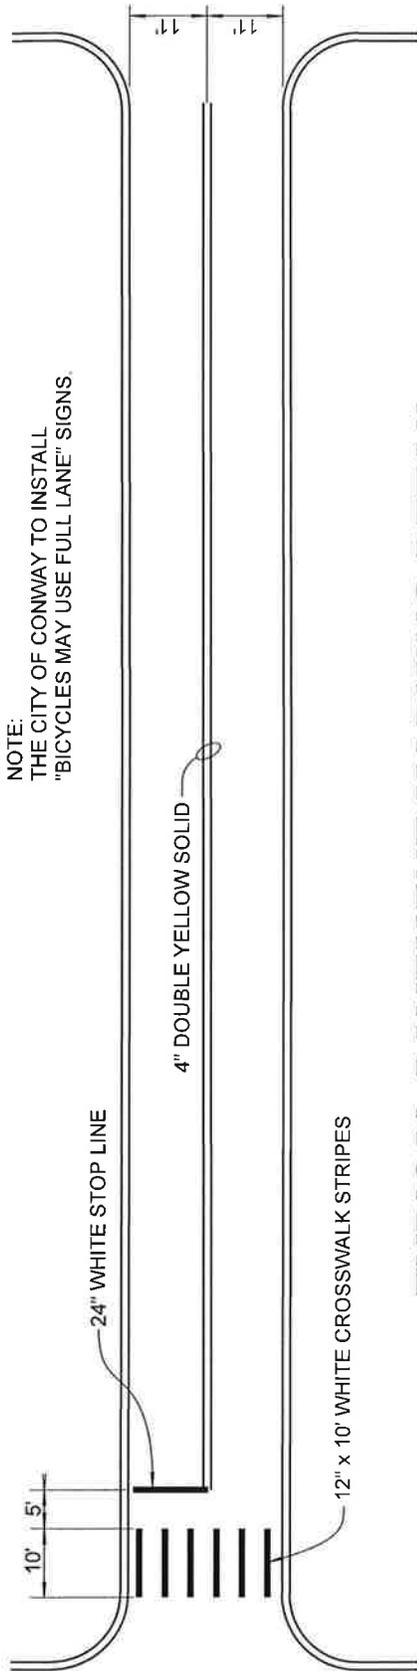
DETAILS OF WHEELCHAIR RAMP AND CROSSWALKS
